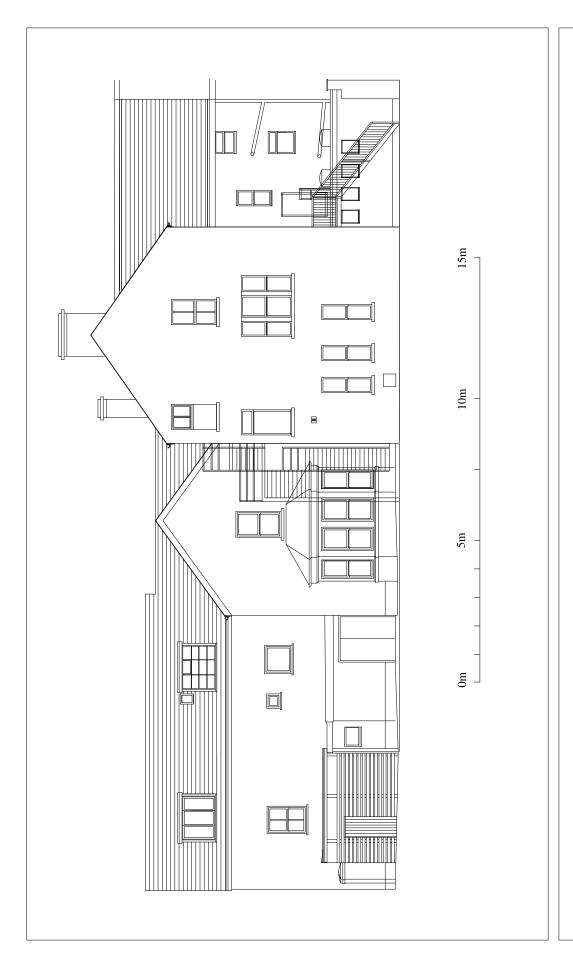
Prince of Wales, Caernarfon Existing Rear Elevation. Produced by and © Pritchard Bond Architects, Bangor
